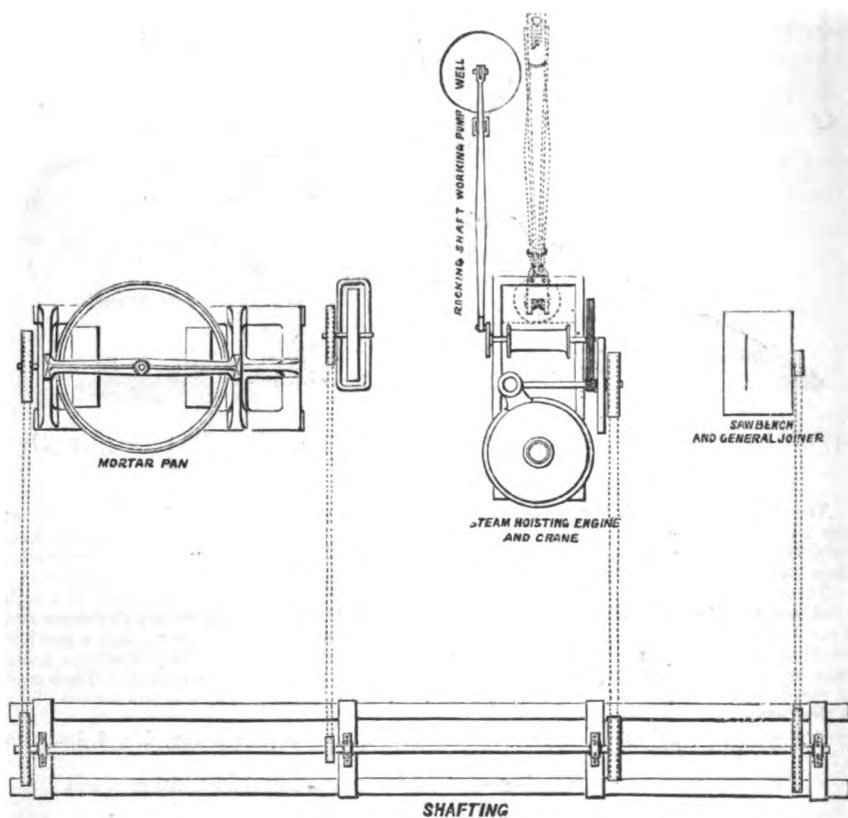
SKETCH PLAN, showing the same Engine set out for working the machinery usually required in the construction of large buildings.
